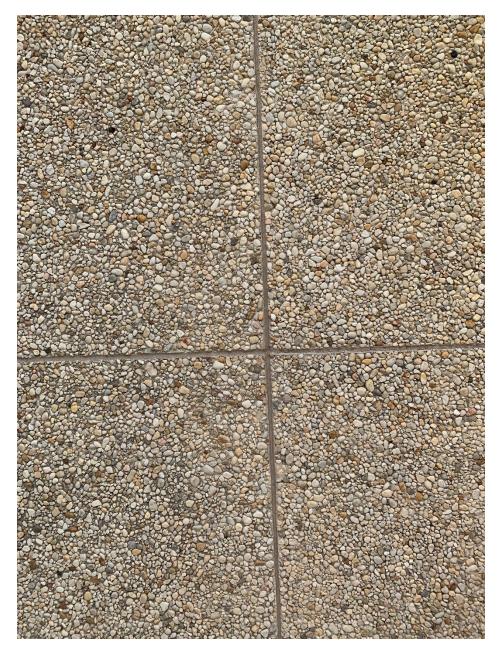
Pier 66 Hotel Tower. Precast concrete panels with expose Chattahoochee aggregate, camera facing north. Photograph taken October 18, 2022.
